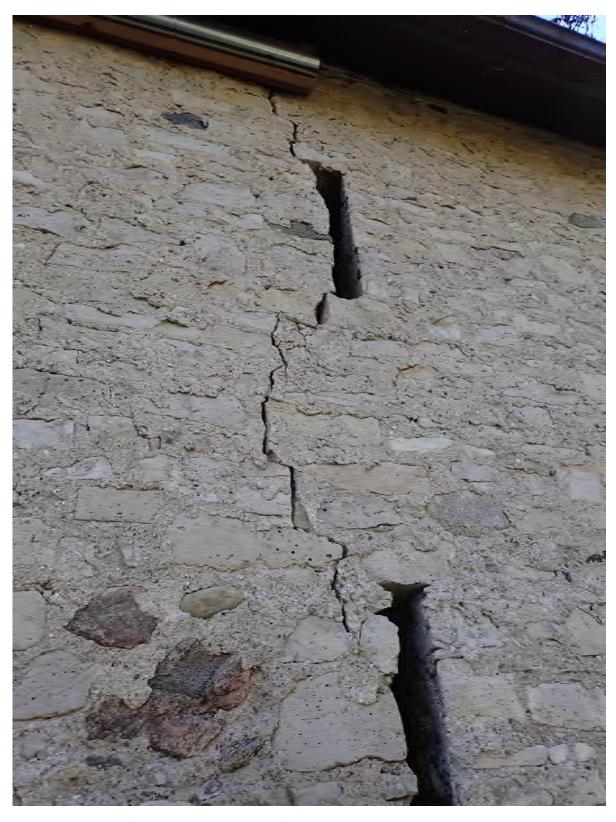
Example of cracking in stone walls. 'Slit' windows are shown.
